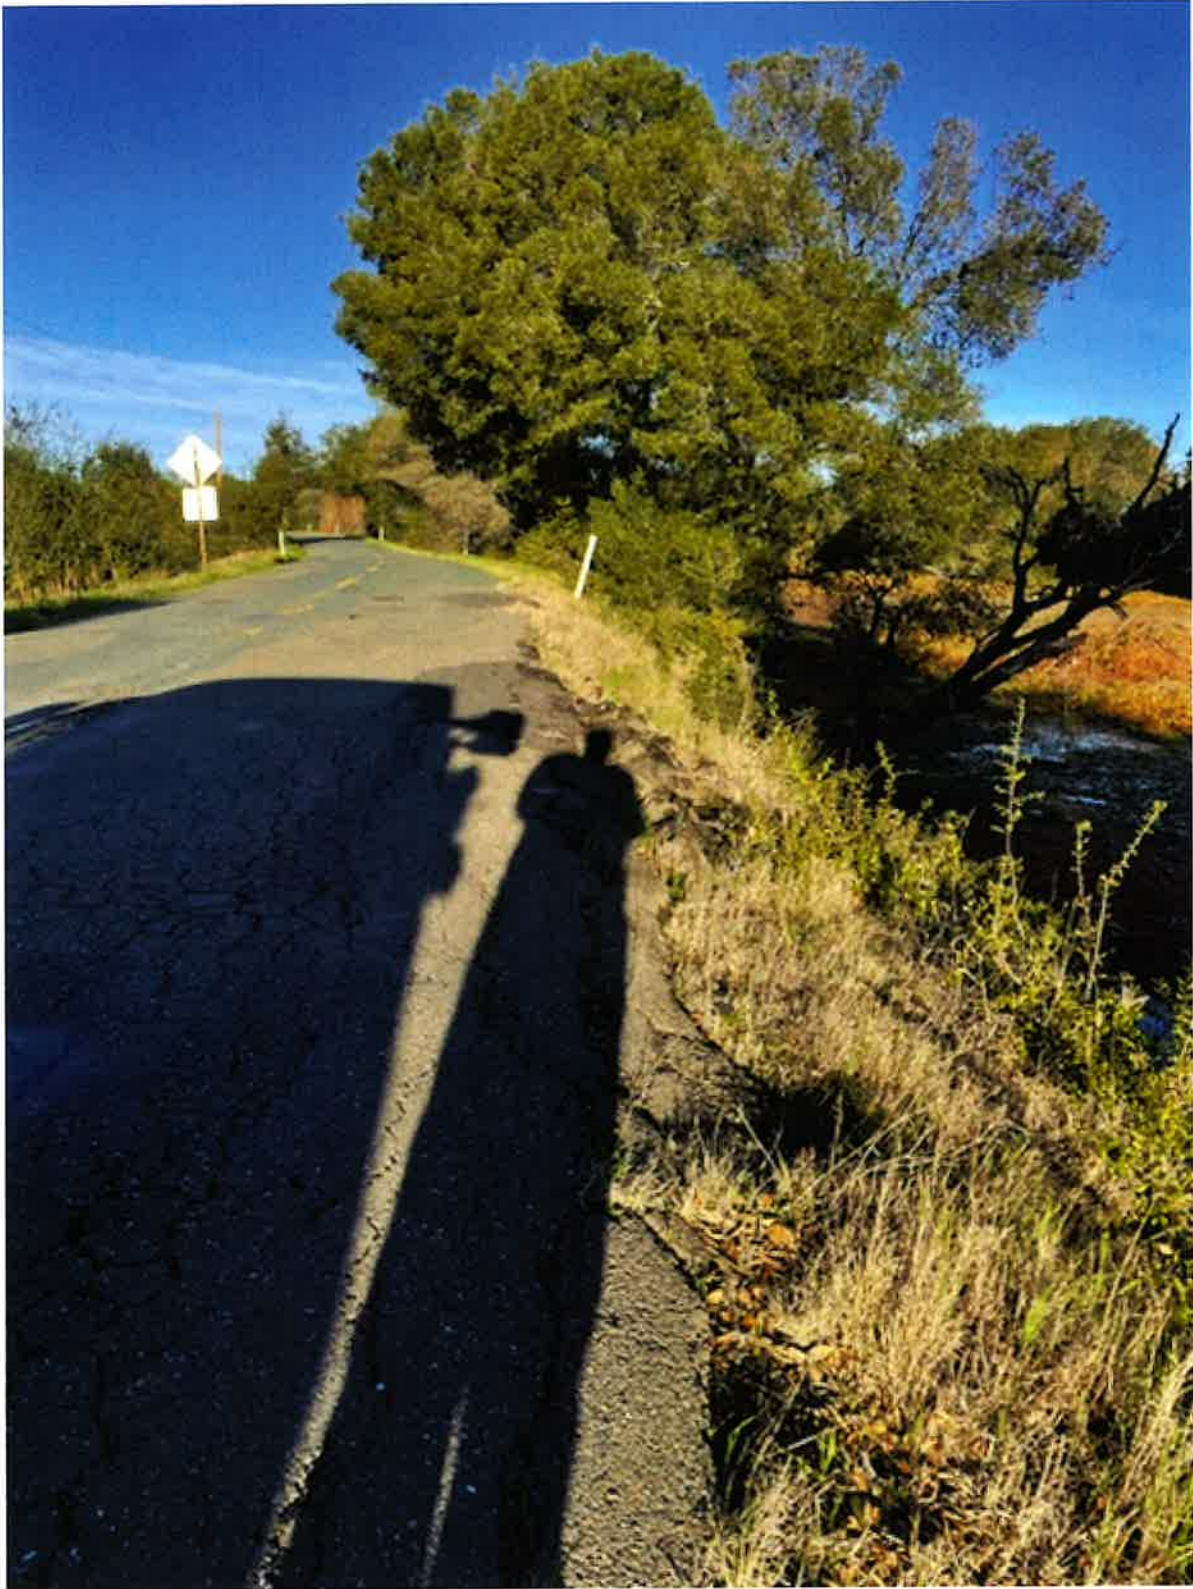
EXISTING DAMAGE SITE CONDITIONS
